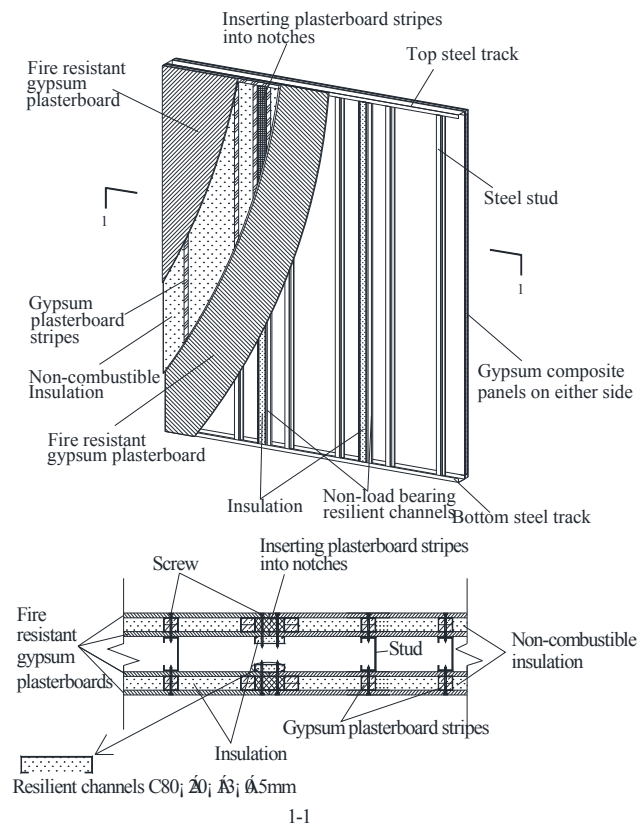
CFS wall lined with gypsum composite panels on both sides
